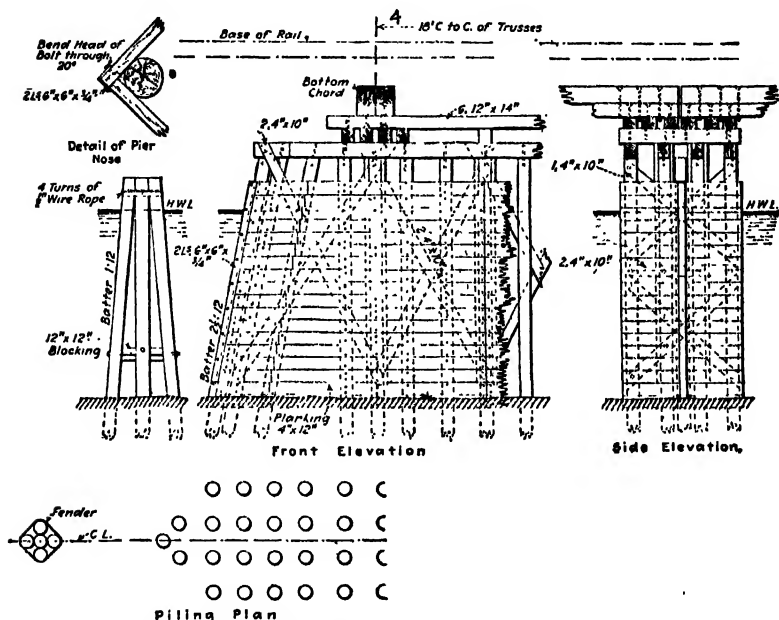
Timber Crib Pier Used on Alaska Government Railroad.
